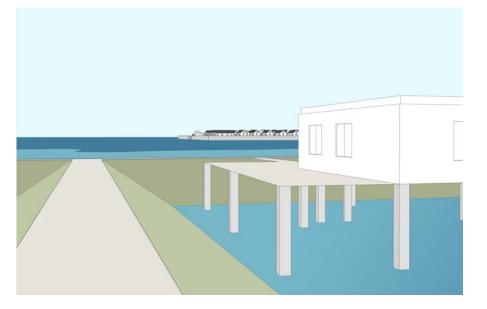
Perspective - elevated buildings + water (Borner 2020).
